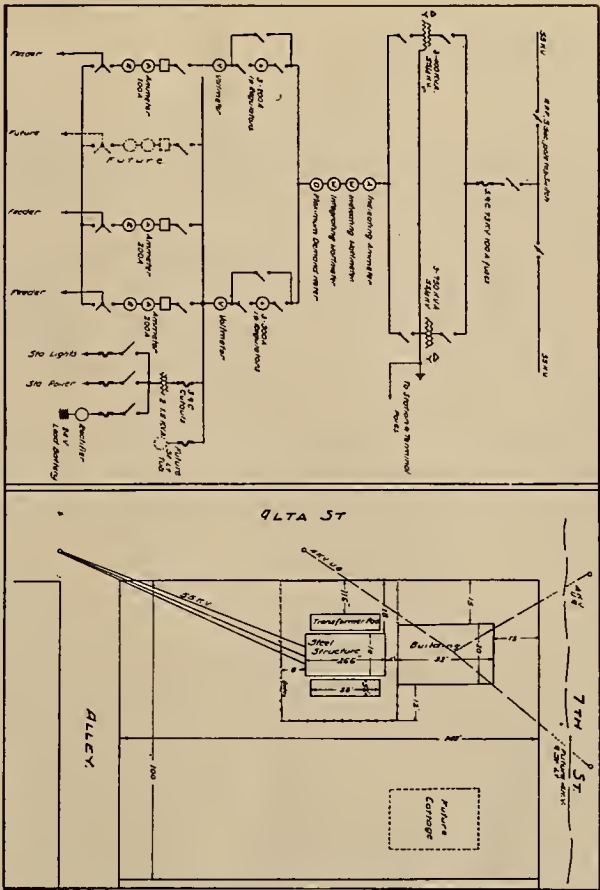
Below—plot plan of substation grounds. Above—single-line wiring diagram; Gonzales substation.
